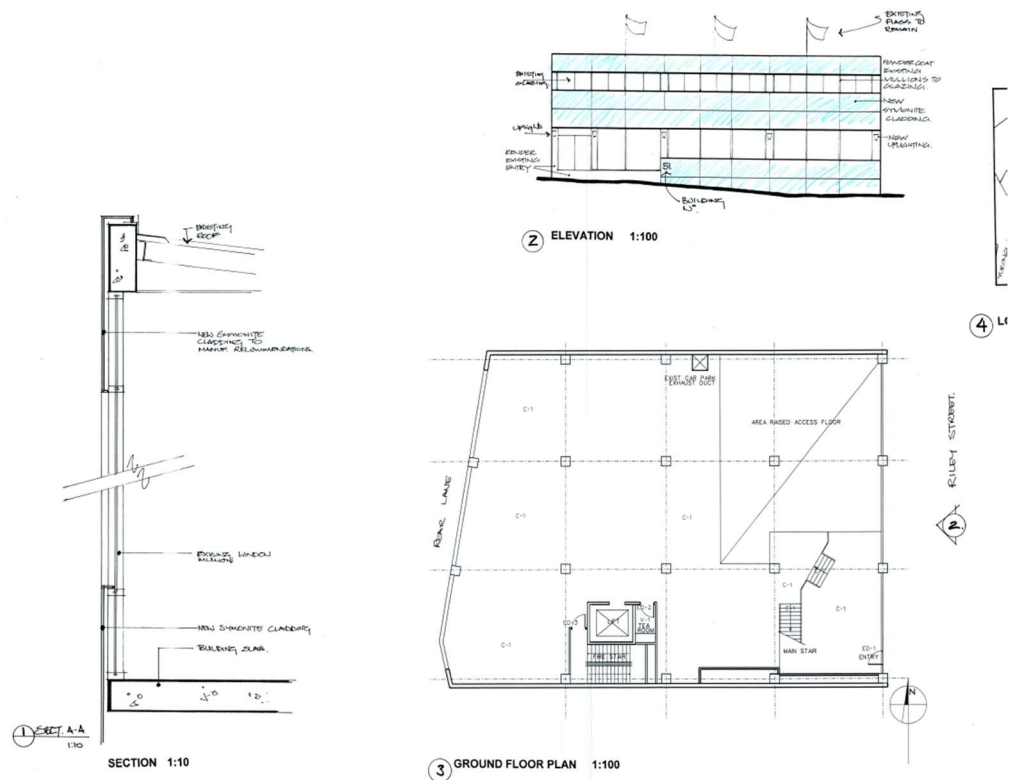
Ground floor plan and elevations for alterations to façade, by CRA Design Associates, April 2001 (Source: City of Sydney Archives, A-00628144)
